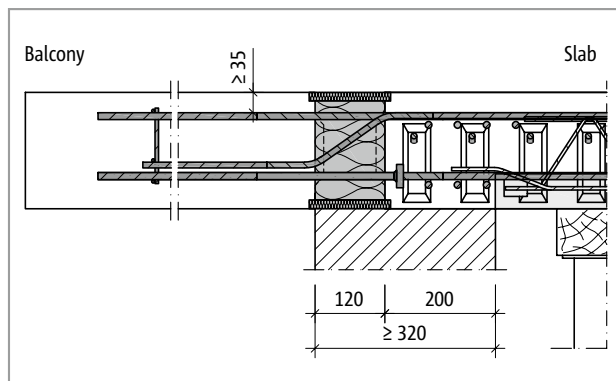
Schöck Isokorb® XT type C: Prefabricated slab with edge support with thermal insulating masonry (section XT type C-L-CV35, view XT type C-R-CV50)
